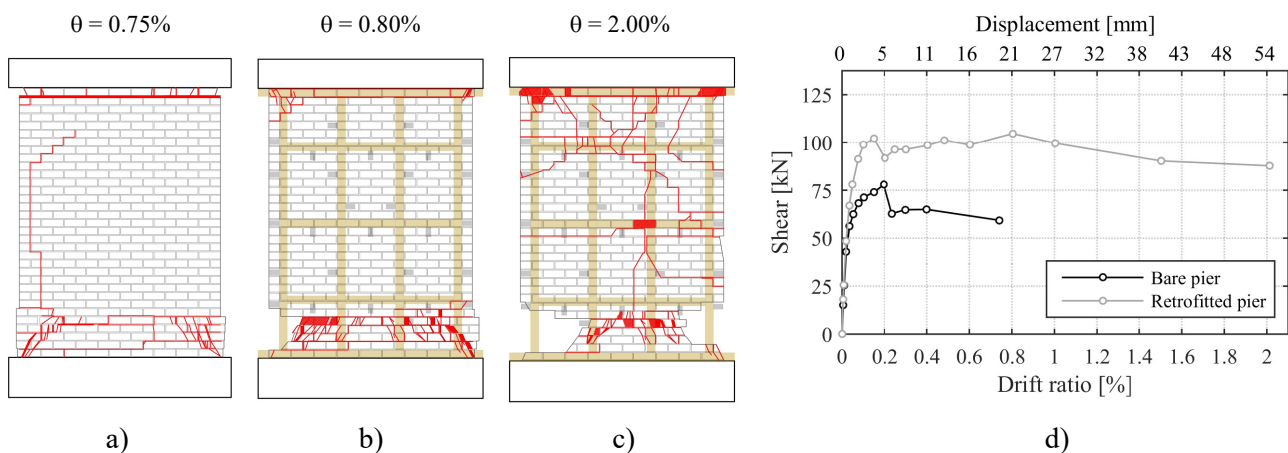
Experimental crack patterns: a) bare pier at ultimate conditions; b) retrofitted pier after the cycles corresponding to the ultimate condition of the bare pier; c) retrofitted pier at ultimate conditions; d) bare and retrofitted pier backbone curves.
